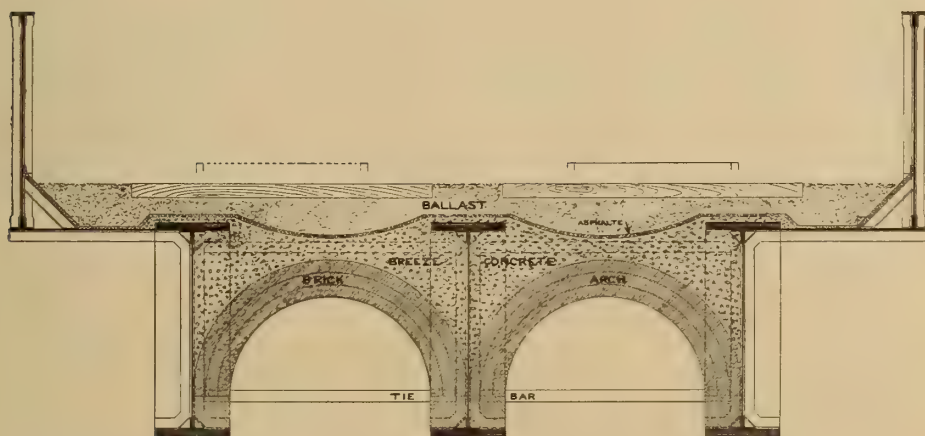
DECK BRIDGE. LONGITUDINAL ARCHES, THREE MAIN GIRDERS, DOUBLE LINE
